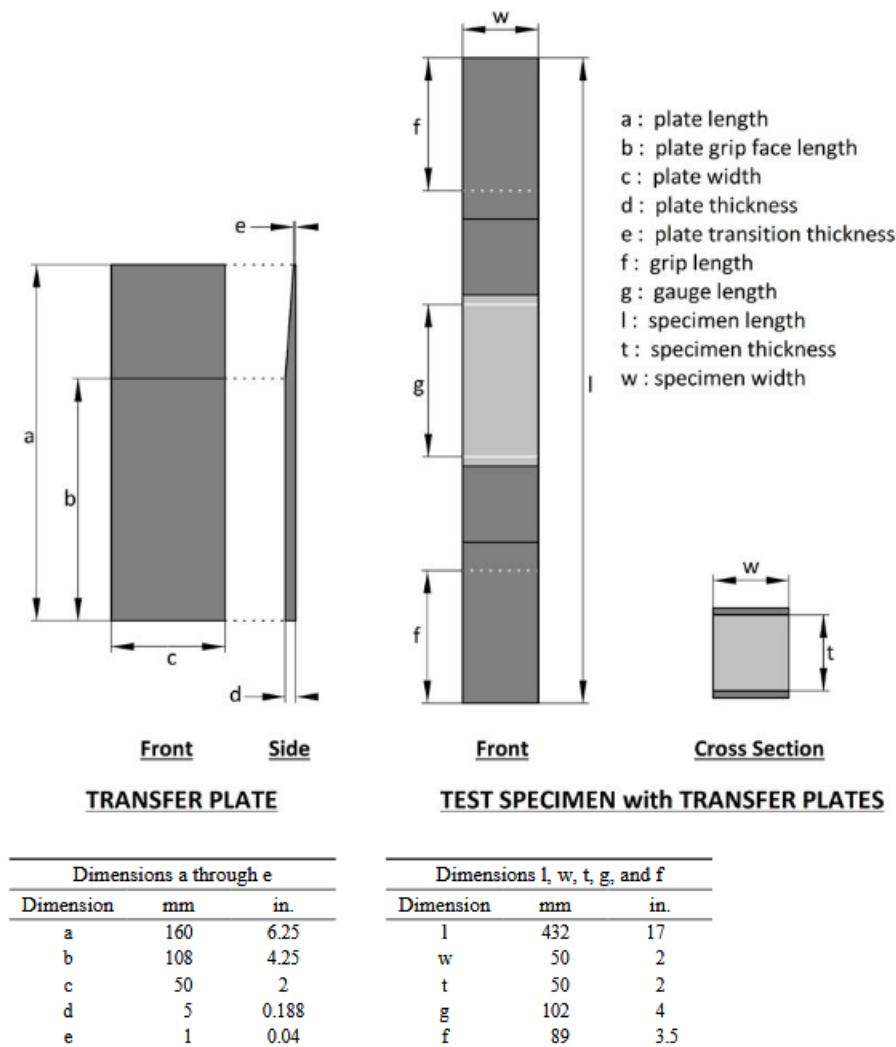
Aluminum Plate and Specimen Dimension (AASHTO T 397 2022)
